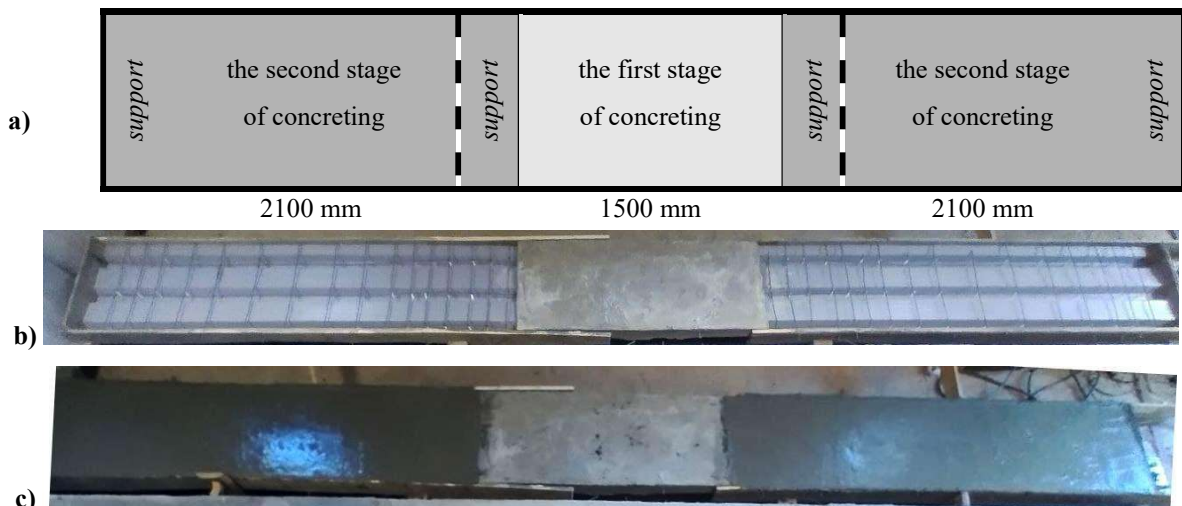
First experimental sample of steel reinforced concrete three-span continuous slab on a non-removable formwork from a profiled steel sheeting:
